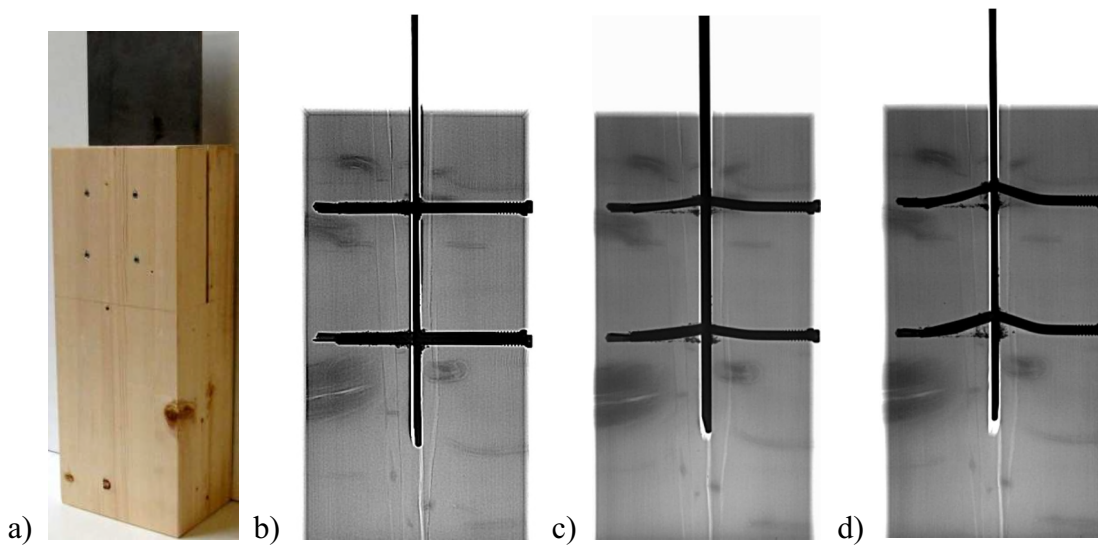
Connection with mechanical fasteners, a) Test specimen, b) unloaded connection, c) and d) connection with plastic deformations
